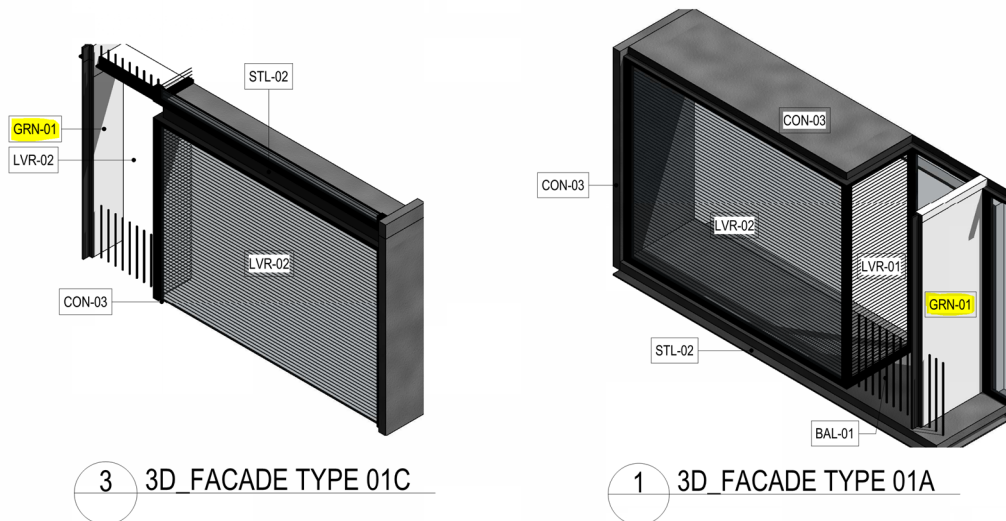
(Left) – Green Wall Location for Façade Type 01C for Hotel Rooms (Hassell, Design Report)
